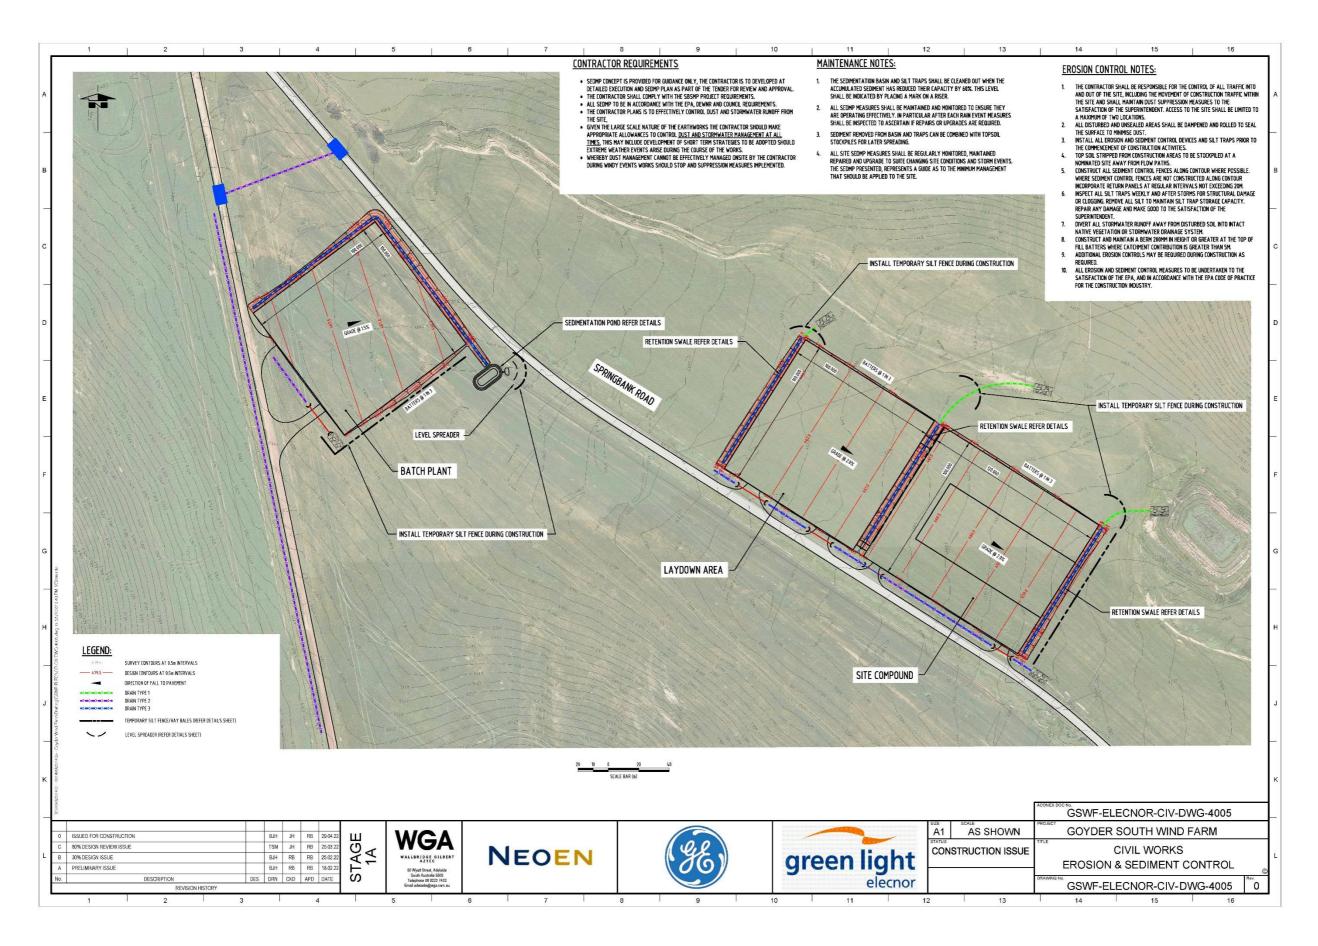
Erosion and sediment control plan of the temporary facilities
